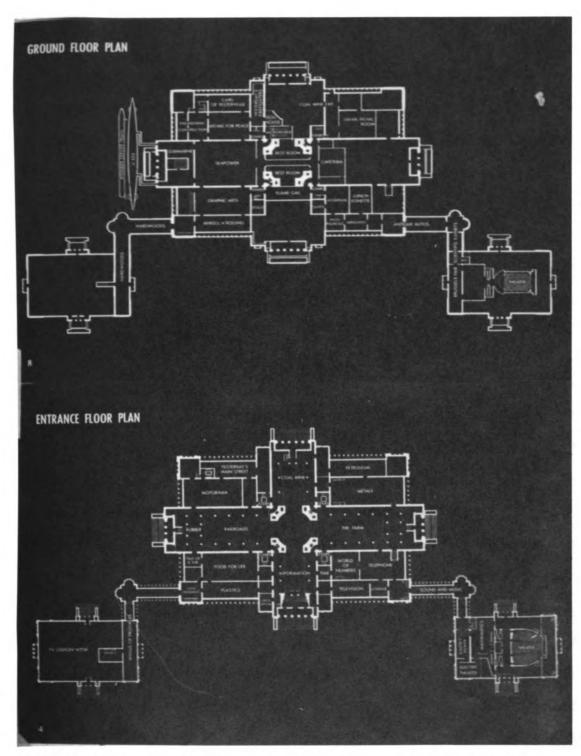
Floor plans of the Museum of Science and Industry, Chicago.
